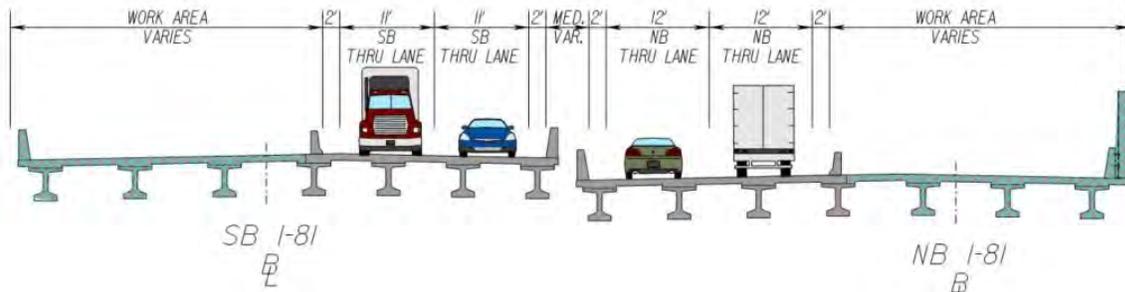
Stage 2 Construction Bridge Replacement RT 112 (step 1 and 2), RT 619 and RT 635
